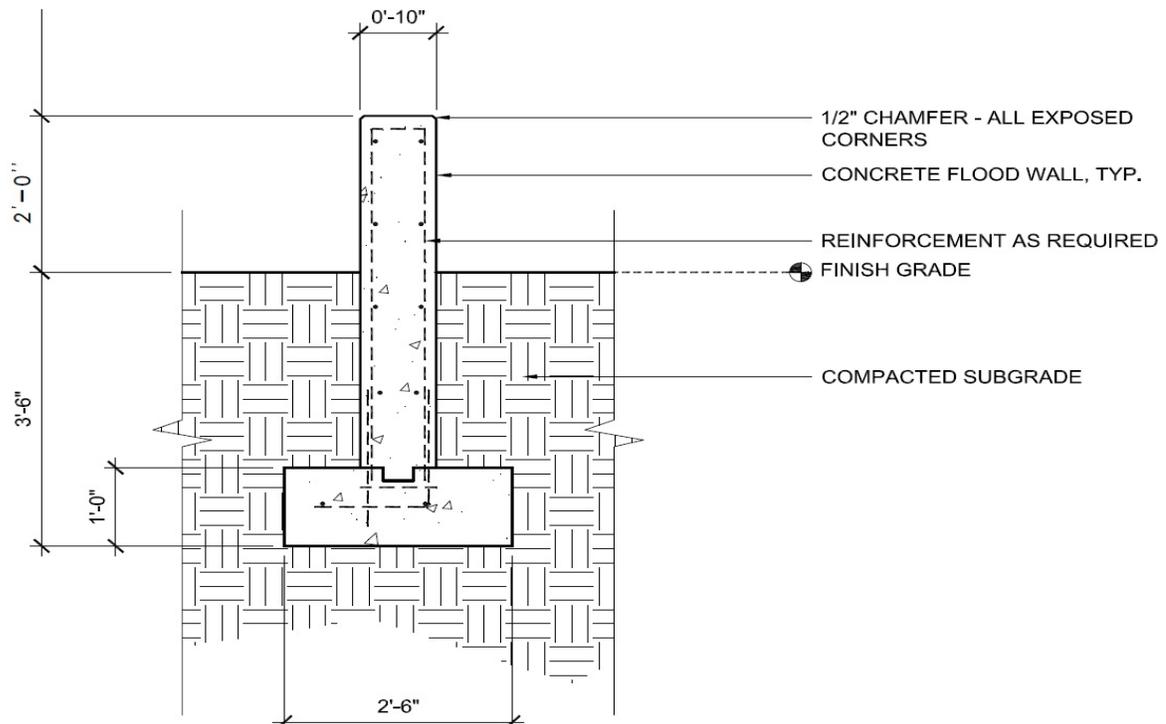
Cross-Section of 2 ft Flood Wall for Soil Areas 1 to 3
